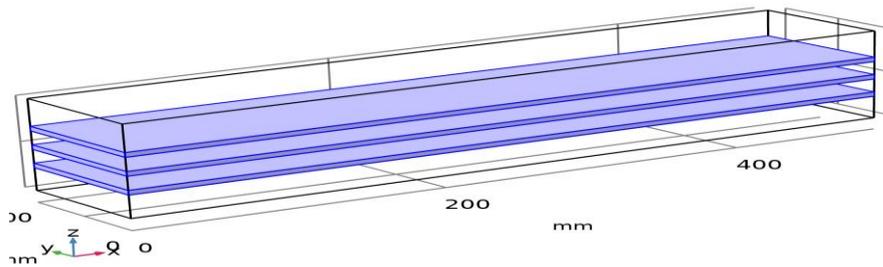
Reinforcement model of rubberized concrete containing 15% of replaced rubber
